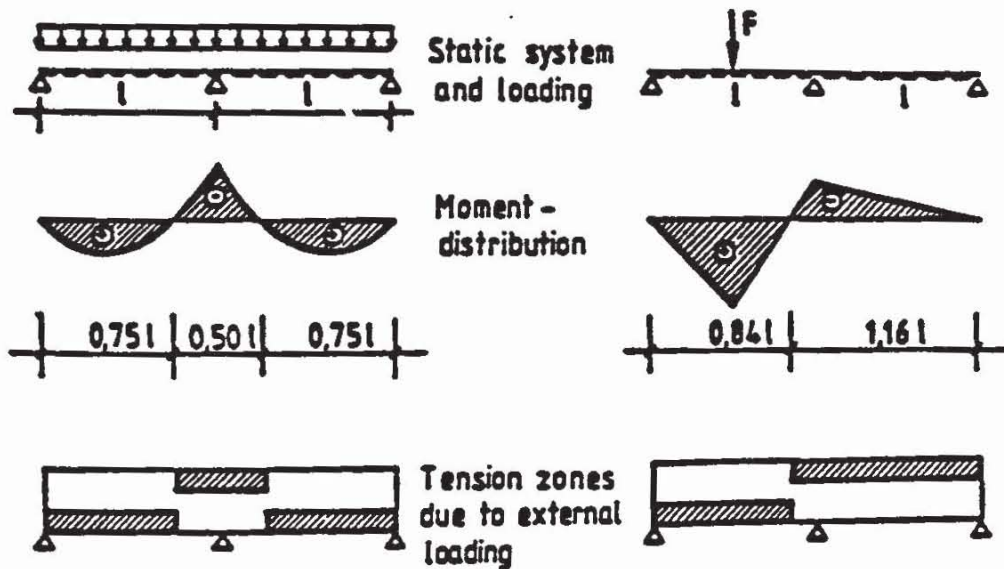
Tension zones due to external loading for a two-span beam (after /4/)
